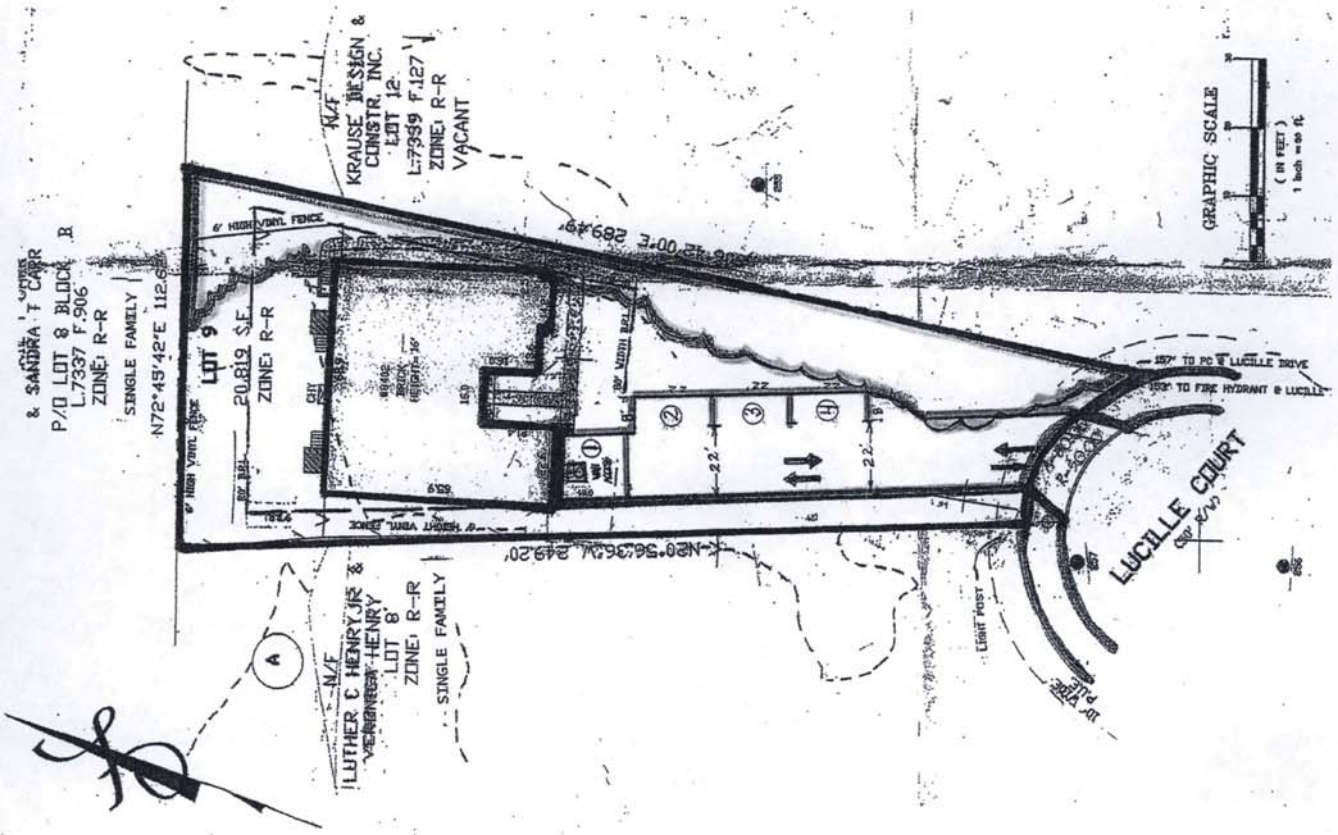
DETAIL OF SITE PLAN SHOWING EXISTING CONDITIONS
